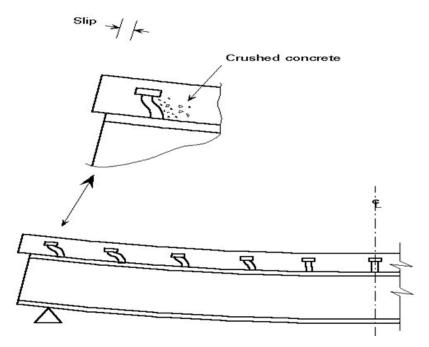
View of the deformed shear connector and slippage at the concrete-steel interface
